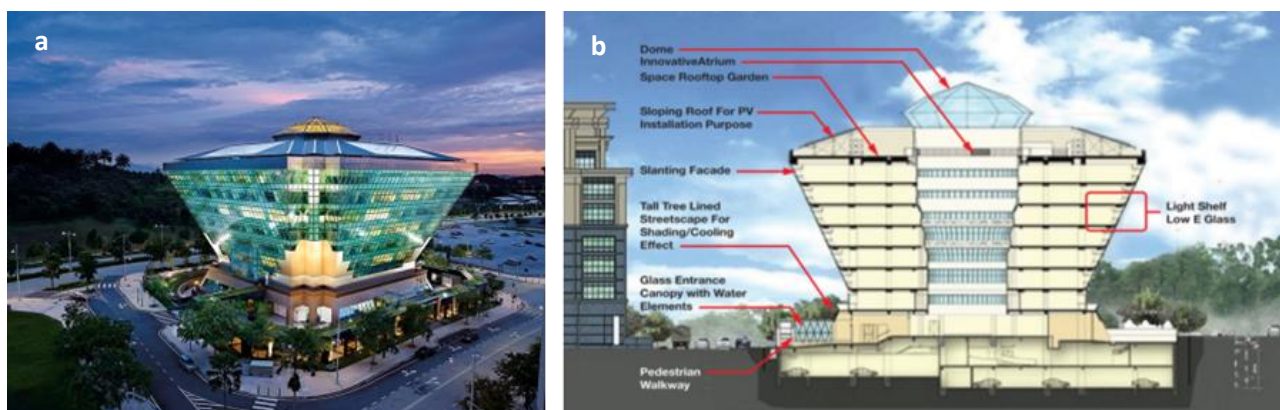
(a) Diamond building at Putrajaya and (b) building structure of the Diamond building [18]
